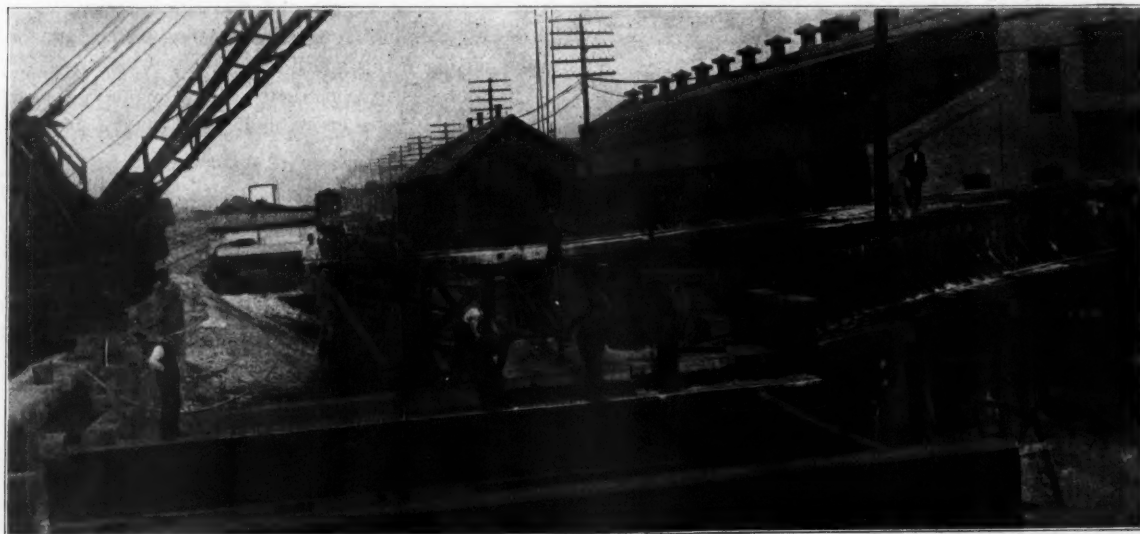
PLACING CONCRETE SLAB WITH DERRICK ON ASHLAND AVENUE SUBWAY, ALSO THE CONSTRUCTION OF THE REINFORCED CONCRETE SUBWAY OVER 16TH STREET FOR SPUR TO OTIS ELEVATOR PLANT, ROADWAY CONCRETE CONSTRUCTION, C., B. & Q. RY.
